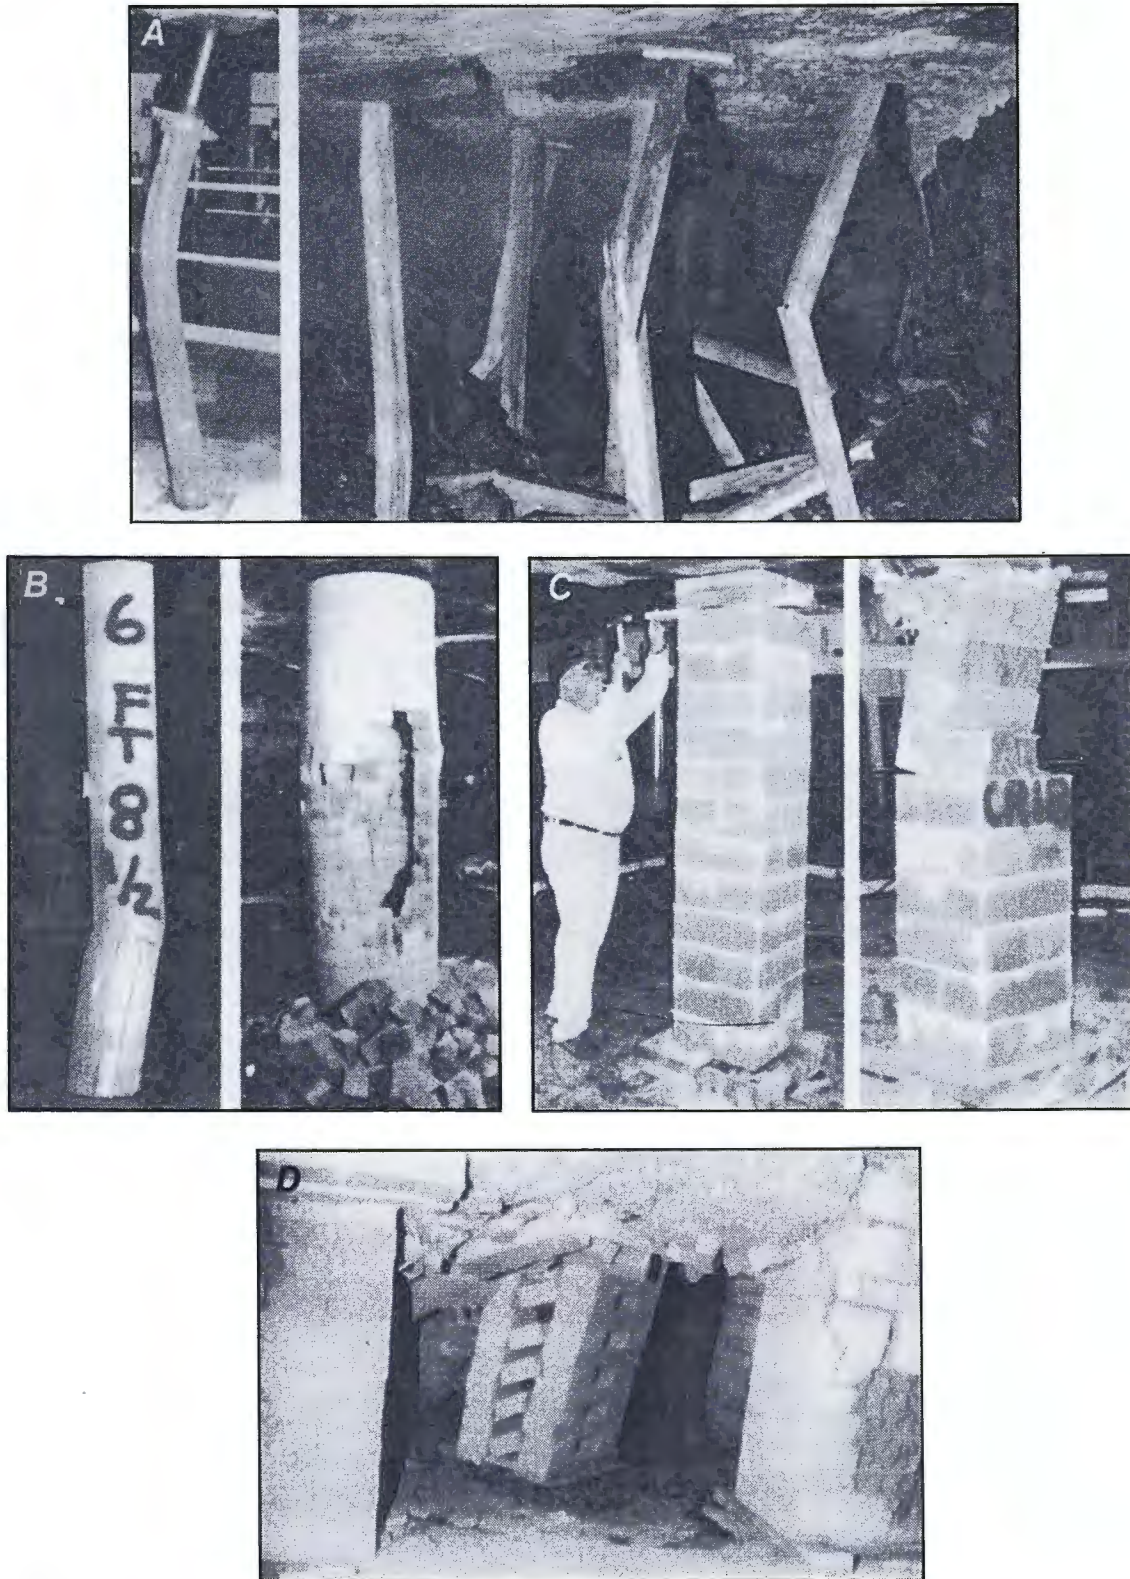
Examples of support instability. A, buckling; B, material failure; C, eccentric loading; D, lateral roof-to-floor movement.
